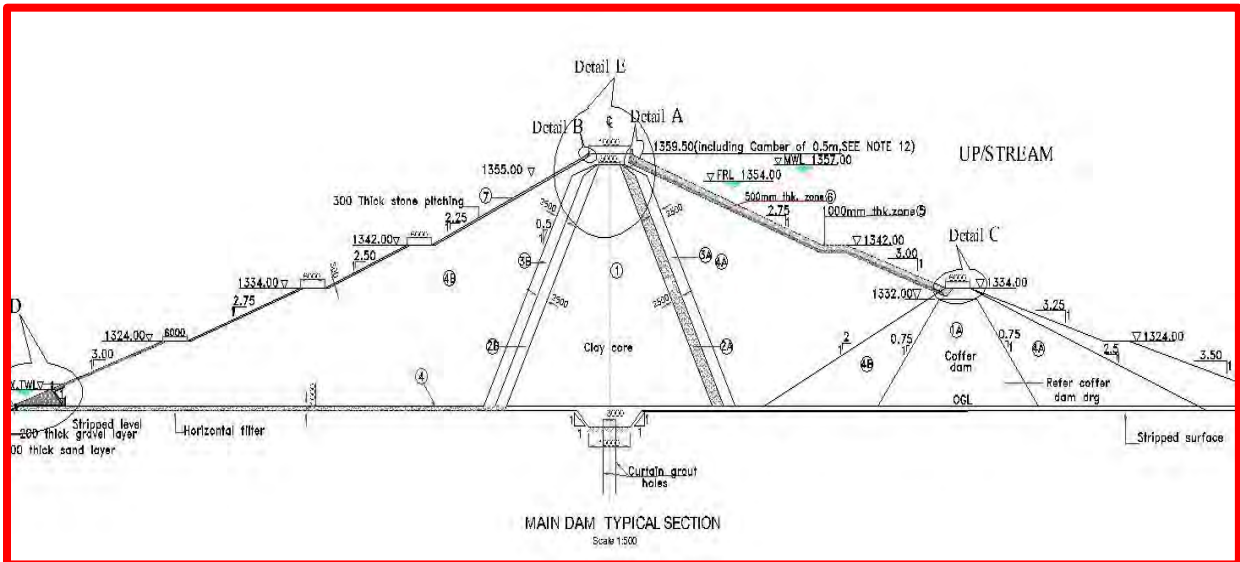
Arjo-Dedessa Dam Cross-Section, Zonings of the Main Dam (OWWDSE, Dec-2013)
